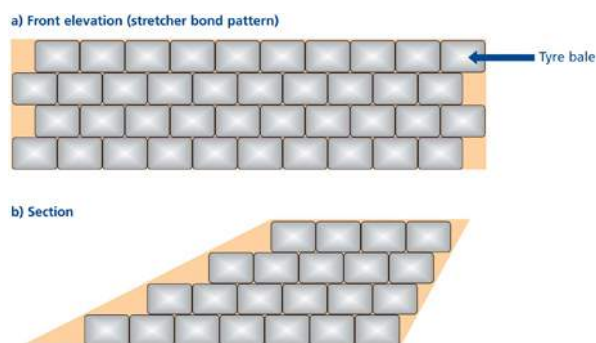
A typical tyre bale repair to a failure in a cutting slope (prior to placement of cover). The tyre bales are shown in grey and all other areas comprise fill.
